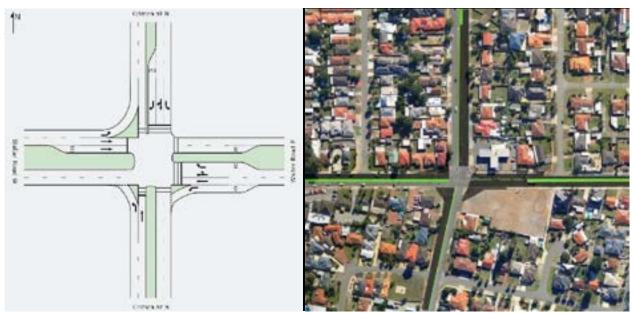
Walter Road West/ Crimea Street – Mitigated Geometry
